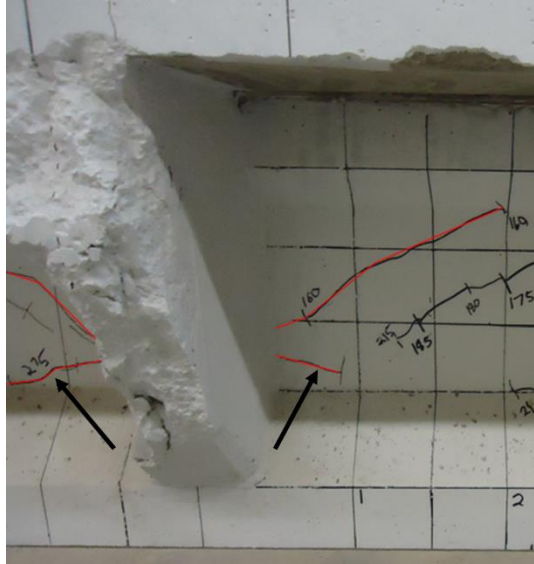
Cracking at center diaphragm of girder C (arrows indicate cracks potentially caused by diaphragm connection)
